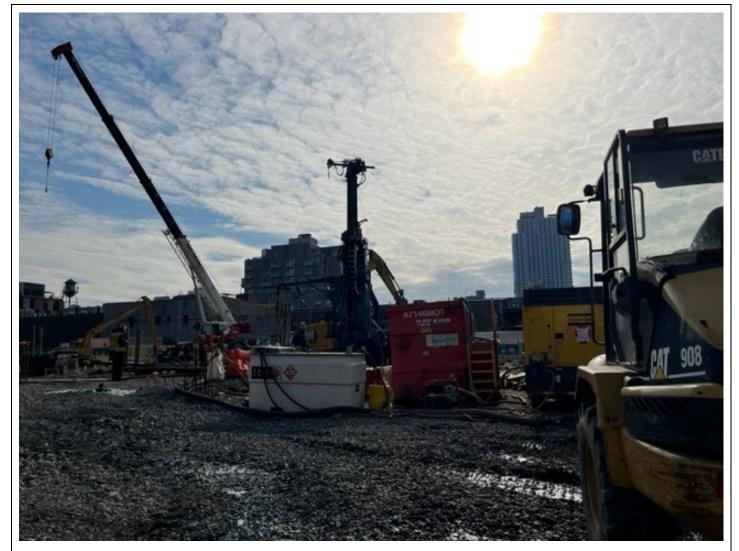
View facing north, CCJV excavating to support foundation footing installation in grid cells SC-5 and SC-6.
